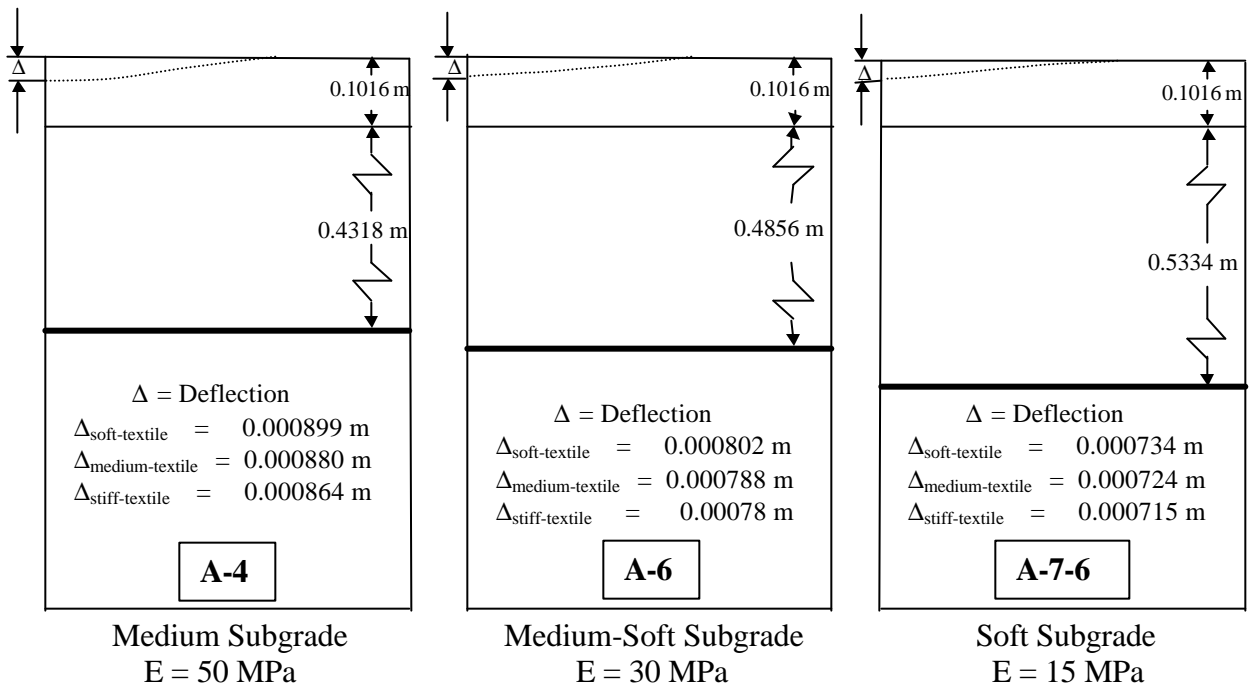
Road cross-sections and deflections for 300-600 HCADT structure, surfaced, 40° C
